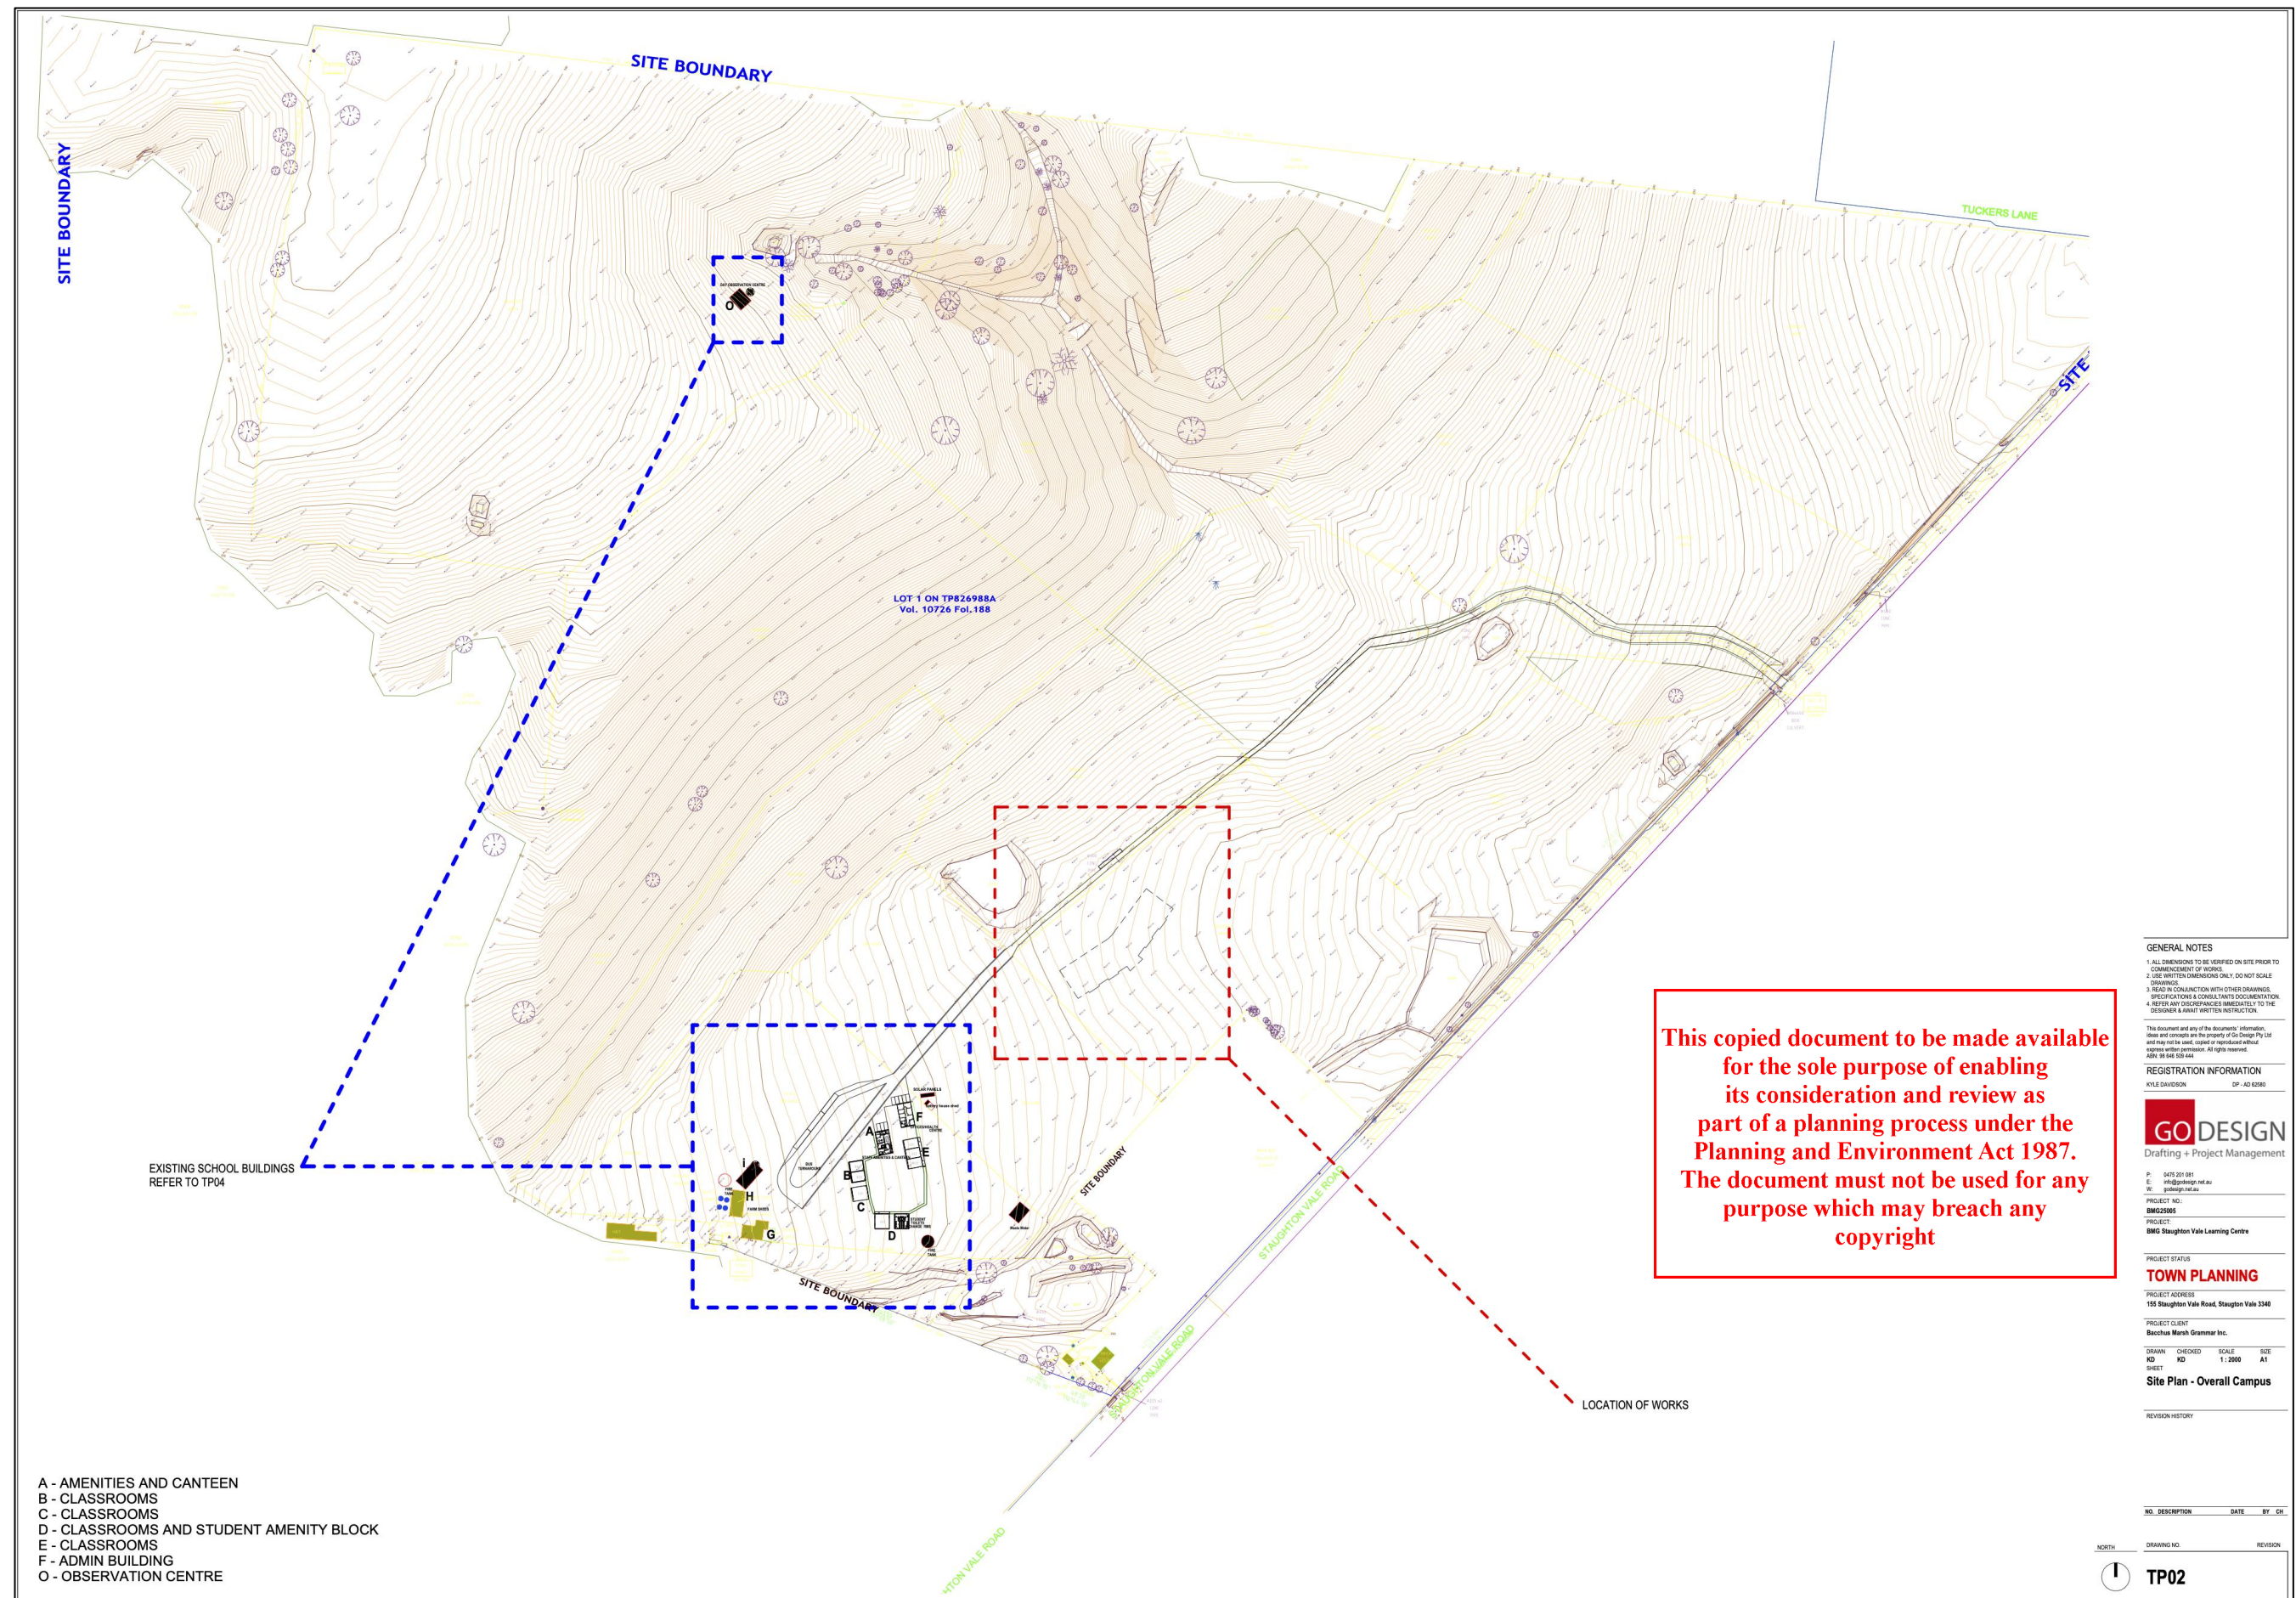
Site plan – Overall Campus (Go Design, 2025).
